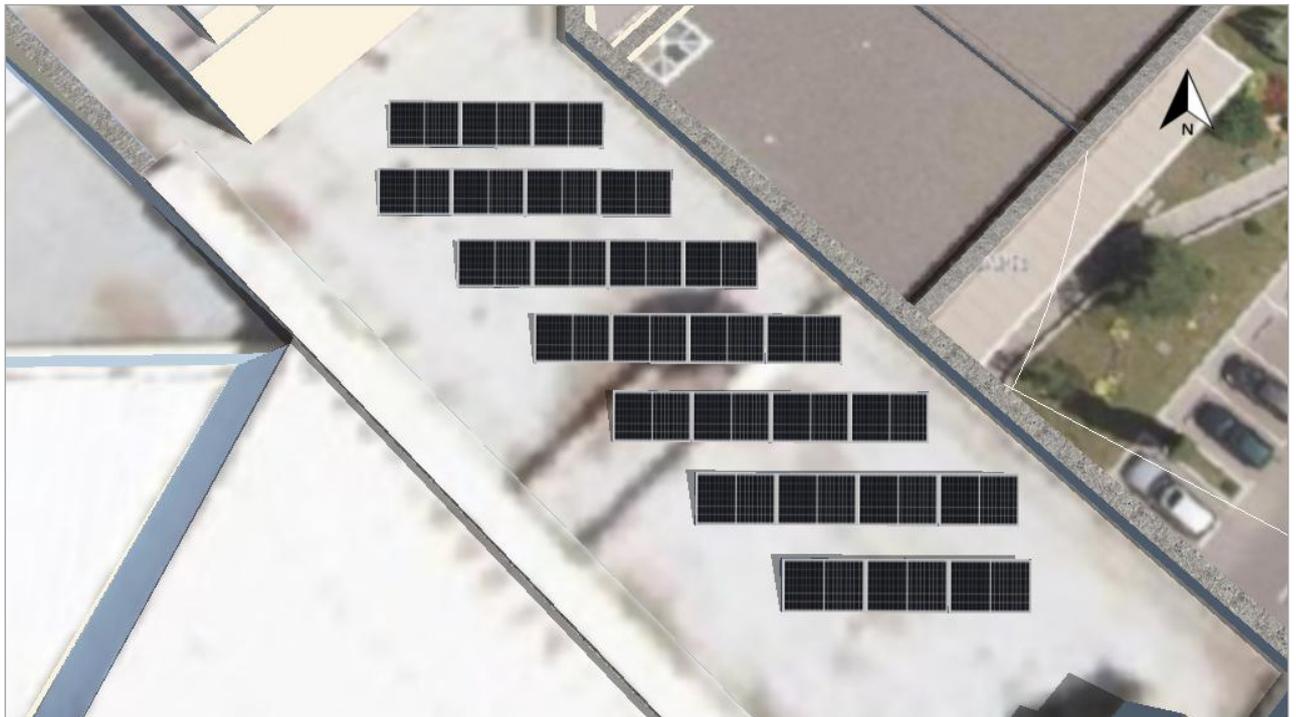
Module Area - Arbitrary Building 03-Mounting Surface Northeast
